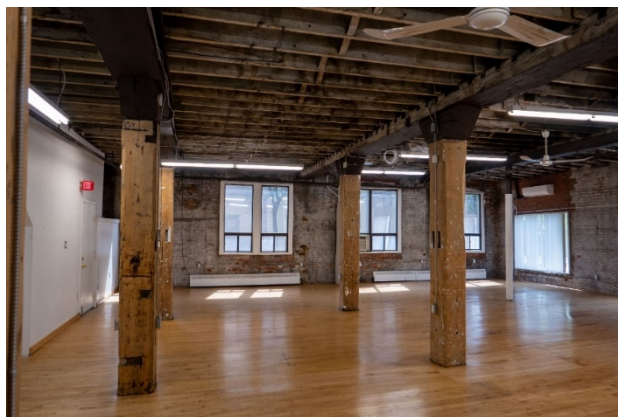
Ground floor of 48 Ferguson, showing salvaged timber posts and beams.
